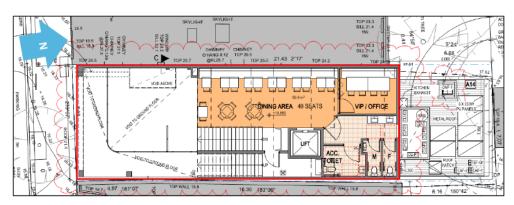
Proposed First Floor Plan (Image Source: YBL Remmus Architecture)
